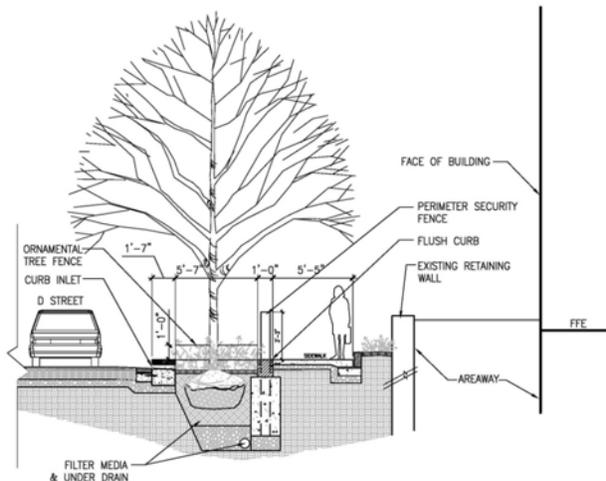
Typical cross-section along D Street showing perimeter security along outside edge of sidewalk
